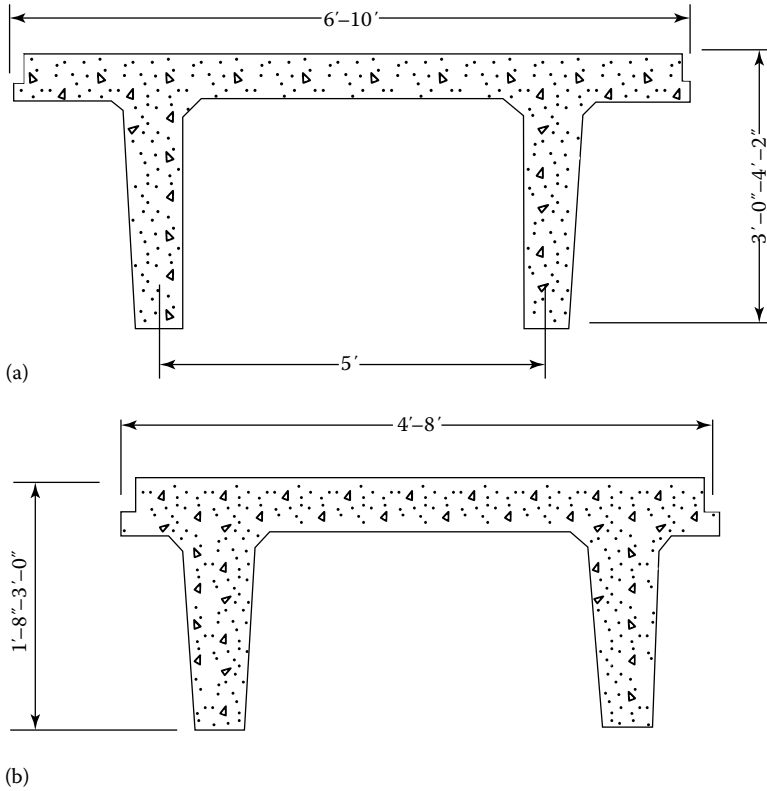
Superstructure system Type *i*: precast concrete double-T girders with shear keys, and with or without transverse posttensioning, and integral concrete deck. Continuous grouted shear keys are provided between the flanges of adjacent double-T beams. (a) Span range 50'–80' large double T and (b) span range 25'–70' small double T.
